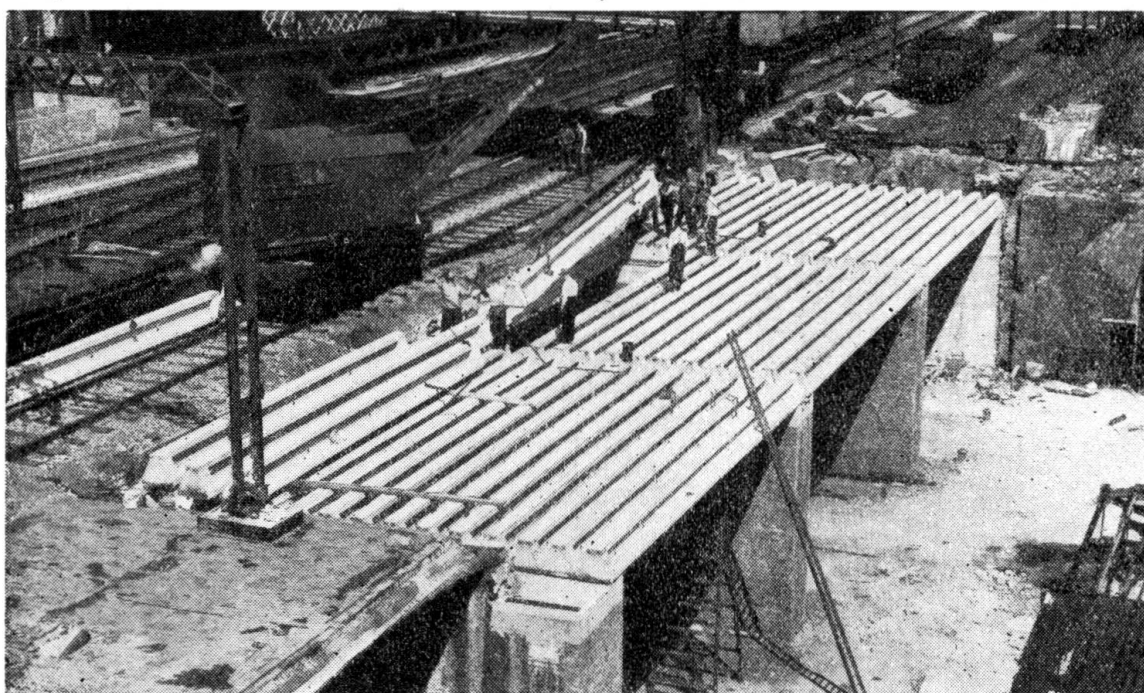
Bridge under Railway siding at Fenchurch Street Station, London
